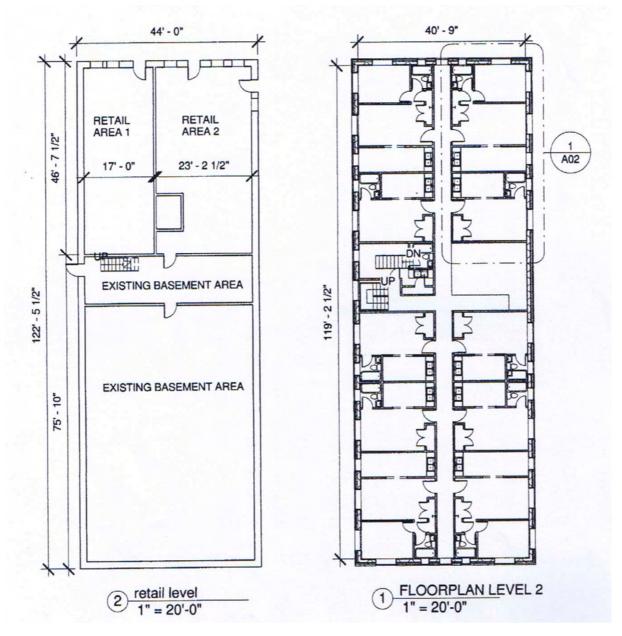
Existing Floorplans for The Wiltshire Apartment Hotel (Avid Architecture and Consulting, 2013)
